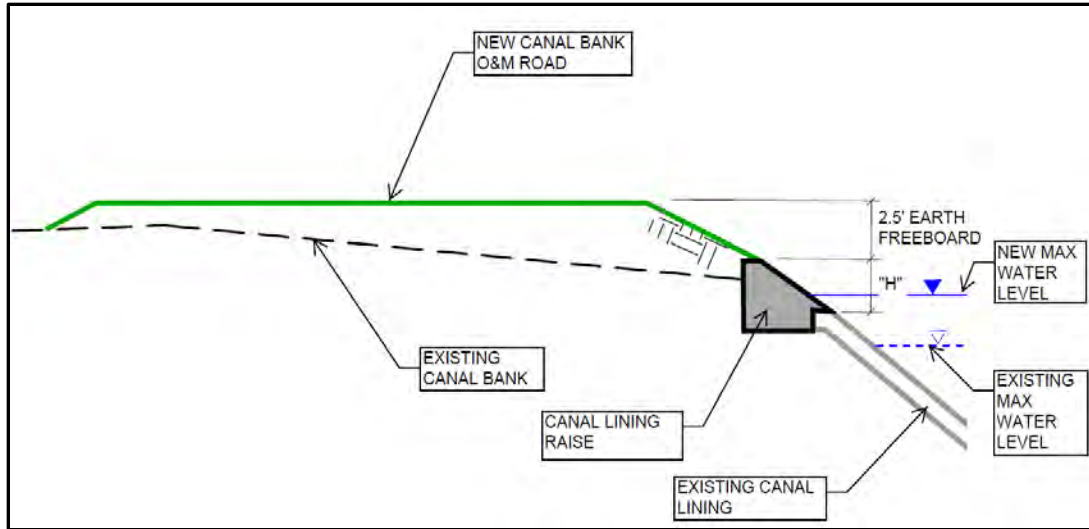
Canal Lining Raise in Segment 1 and Segment 4b of the Recommended Plan
